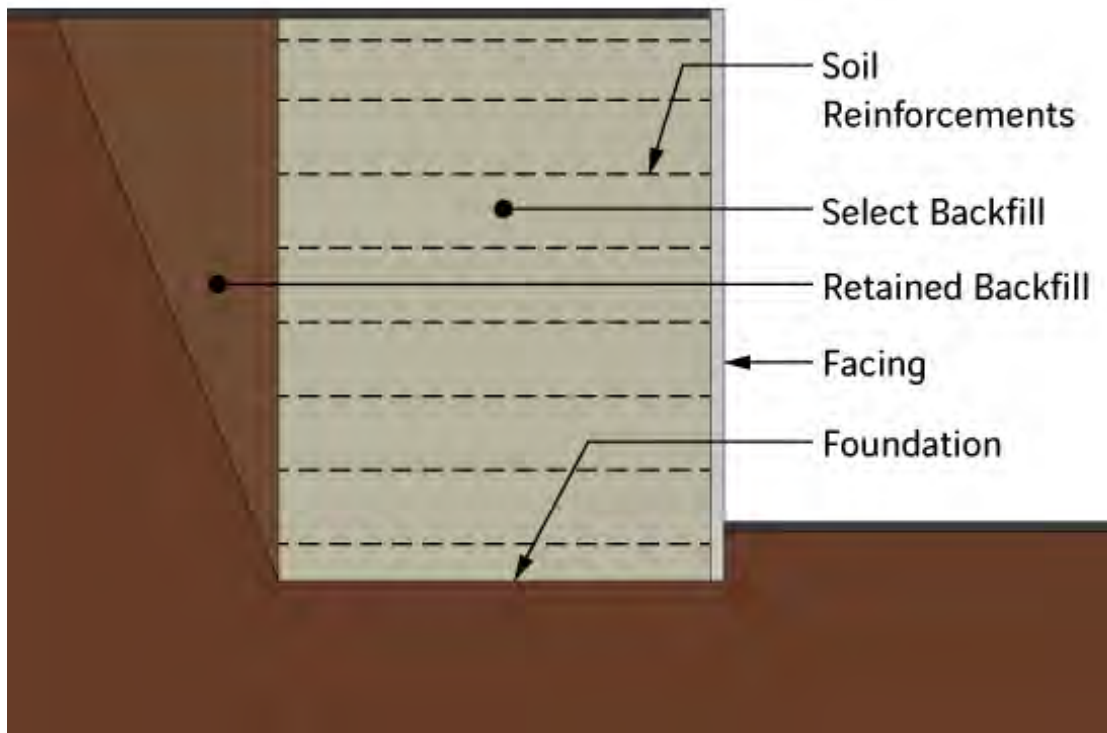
Basic Mechanically Stabilized Earth Wall Cross-Section
